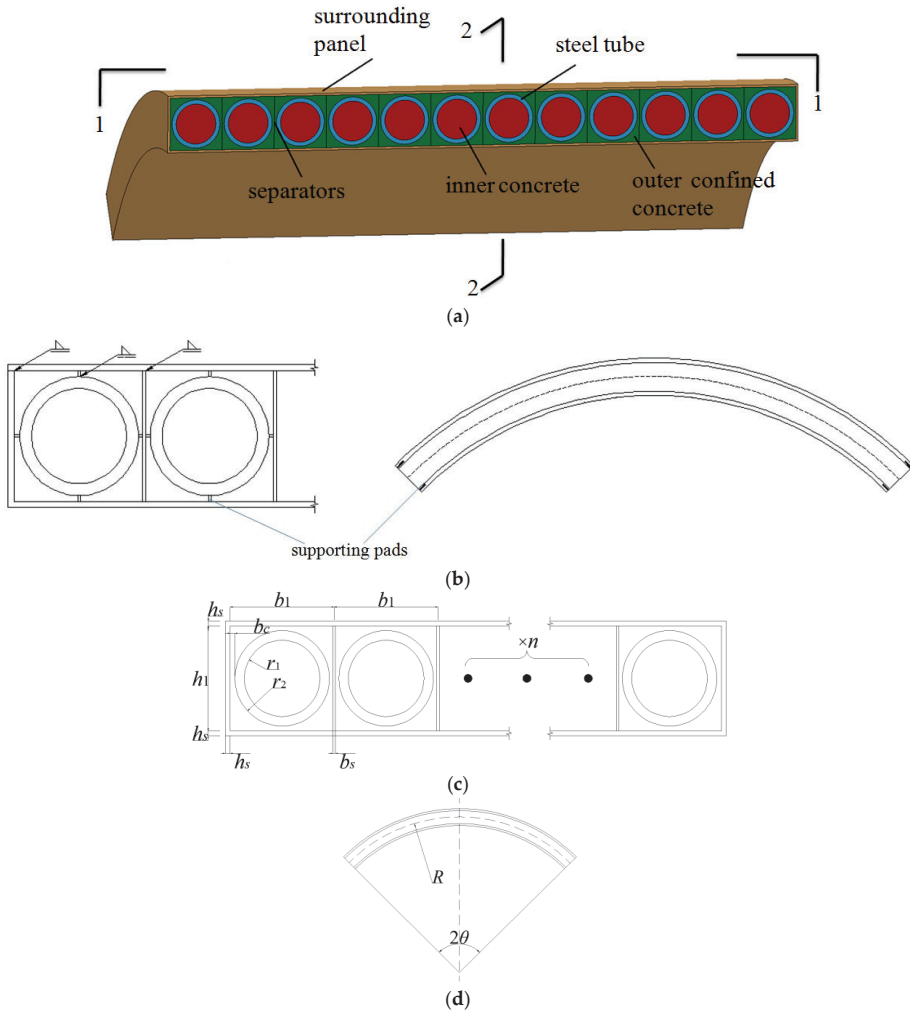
Schematic diagram of the SCCFST arched protective door. (a) Construction of the protective door. (b) Steel connections in the protective door. (c) Size of cross-section 1-1. (d) Size of cross-section 2-2.
